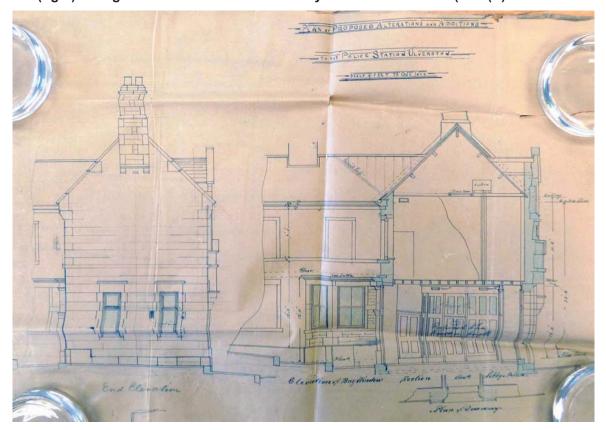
Elevation and section drawings for the new Police Station (CAC(B) Z/1086 1882-1888)
